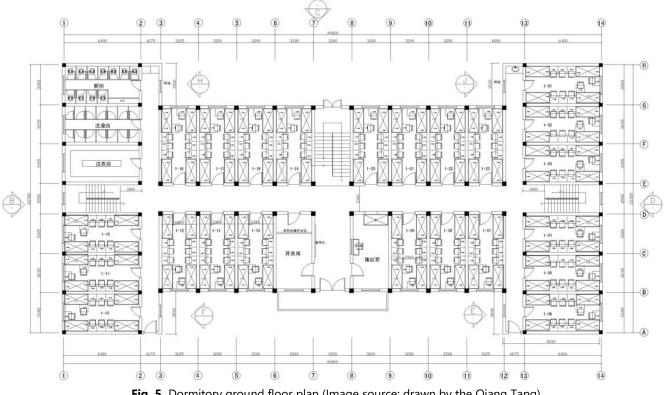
Dormitory ground floor plan (Image source: drawn by the Qiang Tang)
